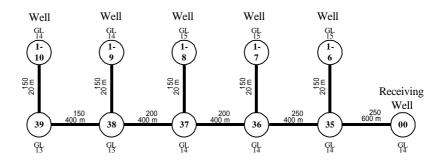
(2/2) Schematic Plan of Well Connecting Pipe : Unit 2 (Well Number 1-6 to 1-10)
